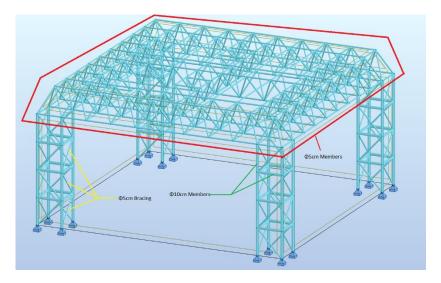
Structure Model with 5 cm diameter Bracing, 10 cm Diameter Members for Columns and 5 cm for Truss Members
